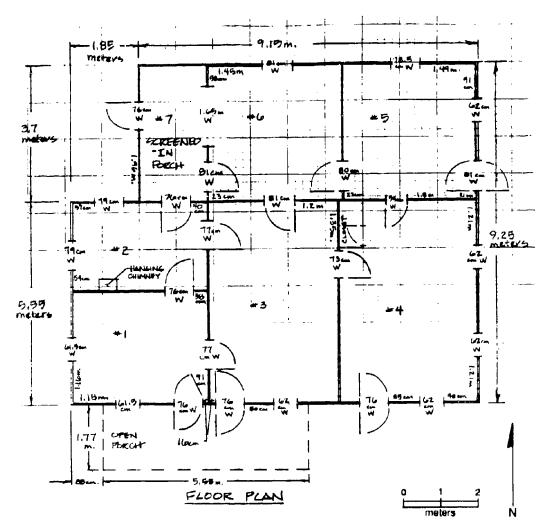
Field architectural floorplan for the standing dwelling at 41CO39.
